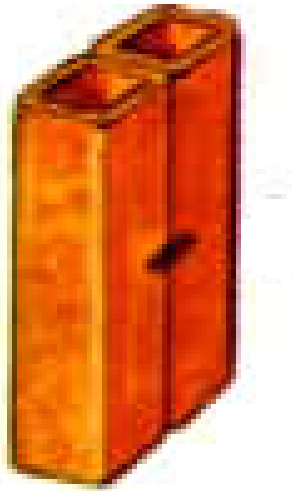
Hollow Bricks/Tubuli Embedded in Walls of Bathhouses
